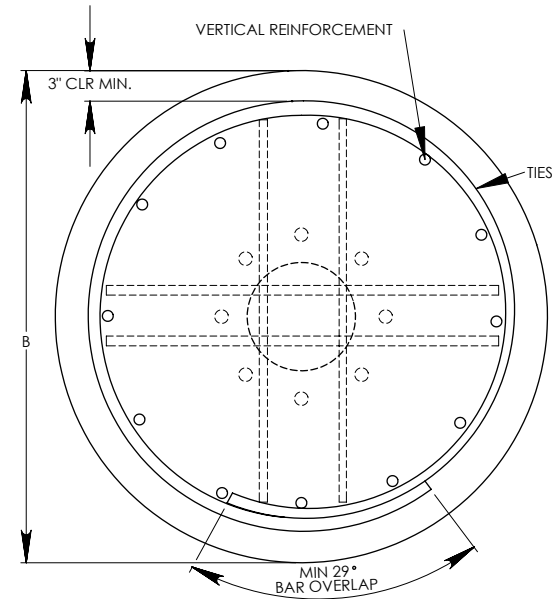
Technical drawing for Pier Foundation 33 ft. Tower
